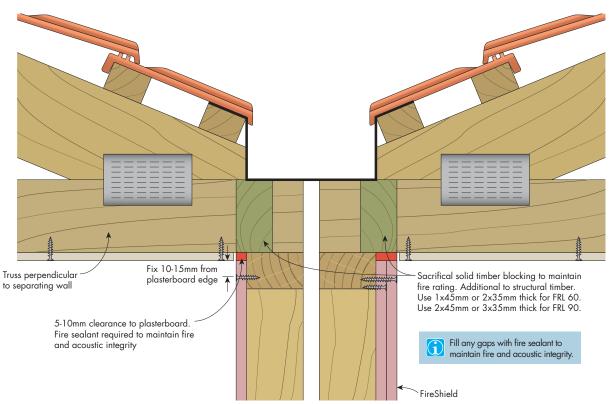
Separating Wall to Box Gutter with Perpendicular Roof Trusses
